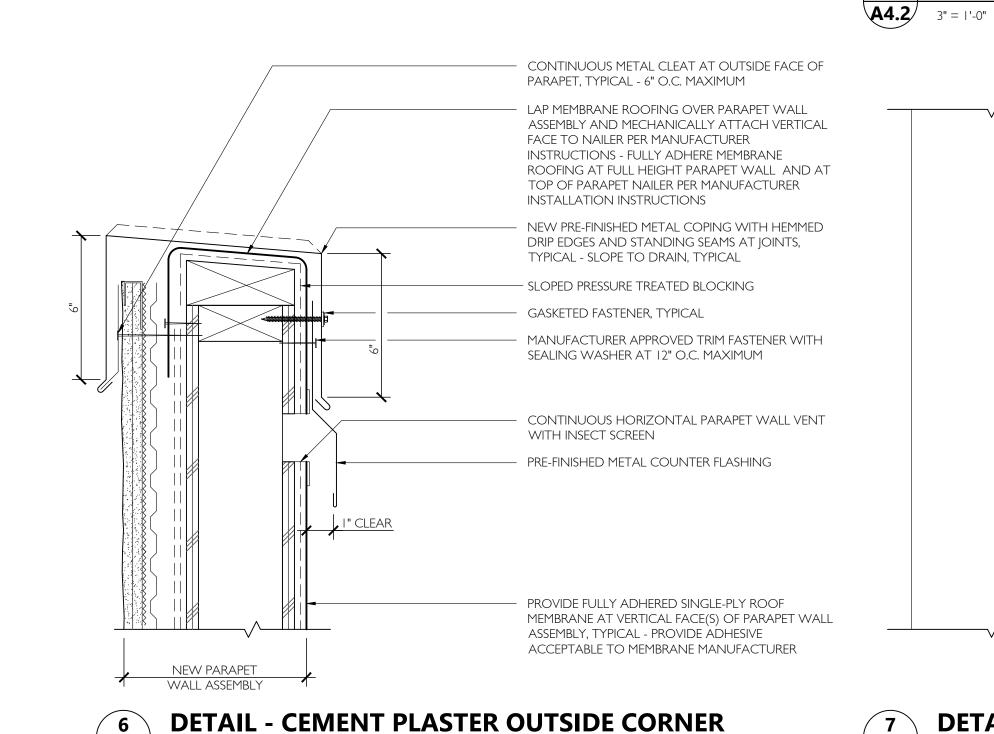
DETAIL - CEMENT PLASTER OUTSIDE CORNER
